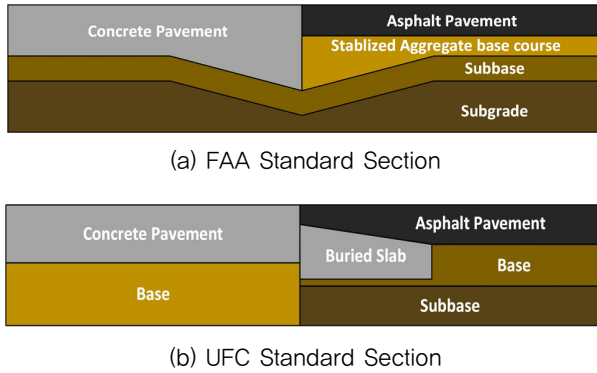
Cross Sections of Pavement Junction Suggested by FAA and UFC
